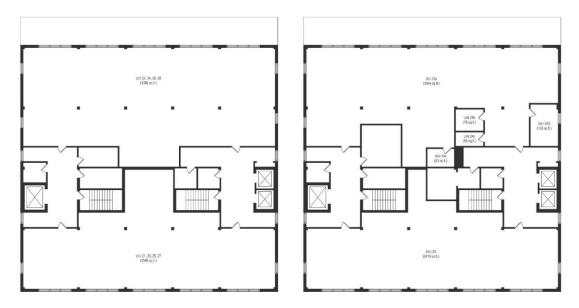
, 487 (left to right): Building 16, tenth floor (1914); same floor (1973); 1'' = 32'. North is down.
